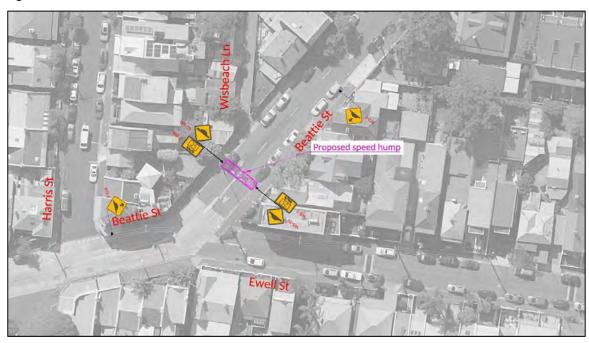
Beattie Street between Ewell Street and Wisbeach Lane proposal.
